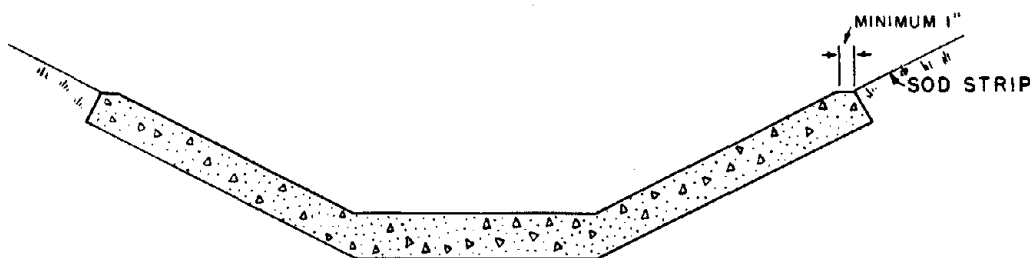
Section of concrete-lined channel showing treatment of edges.
